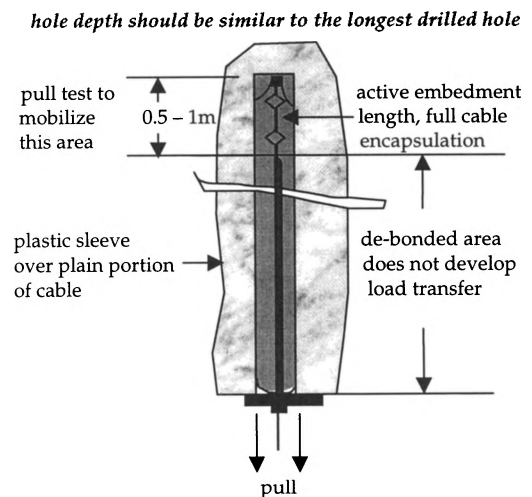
De-bonding techniques to pull fully grouted elements (not to scale).
